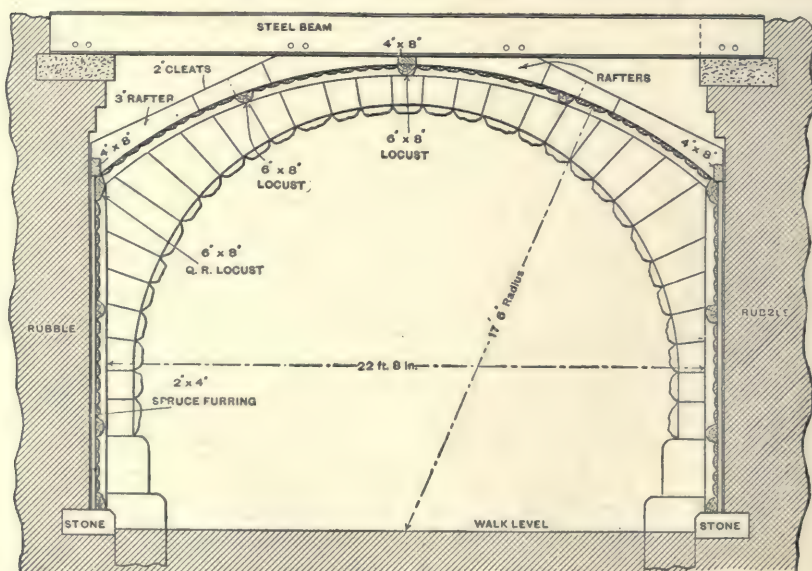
Cross Section of Archway Built at 110th Street, New York City.
